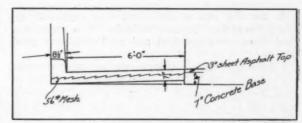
Altered Curb and Gutter Section Indicated in Fig. 2
